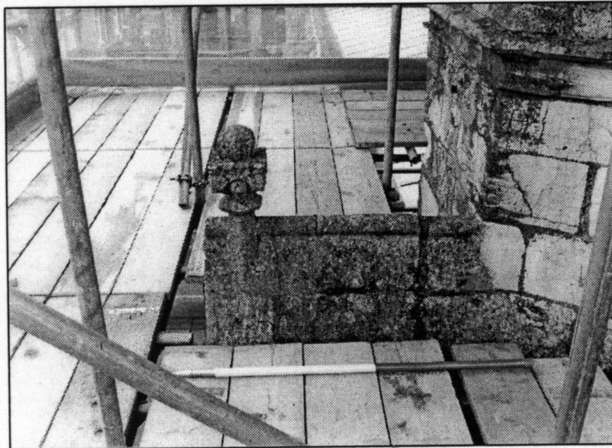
/1: Detail of buttress gable, north aisle turret, looking E.
